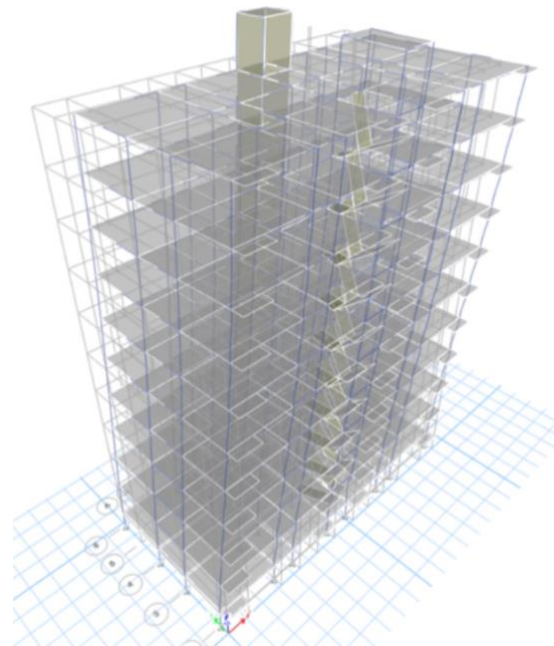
Structure with Masonry wall lift core: Deformed Shape
